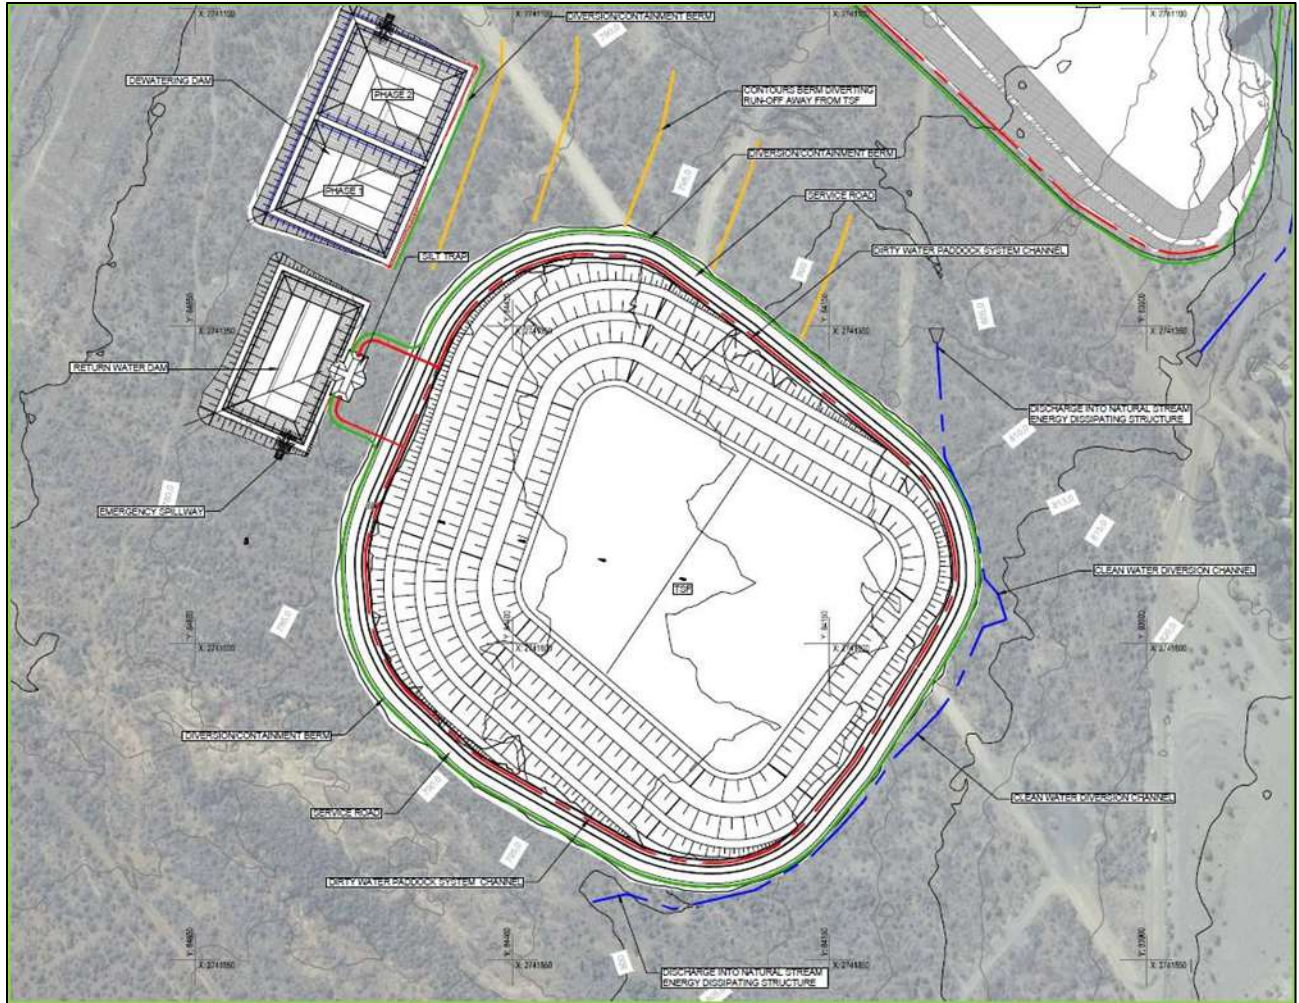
Layout of the new TSF and associated supporting infrastructure.
